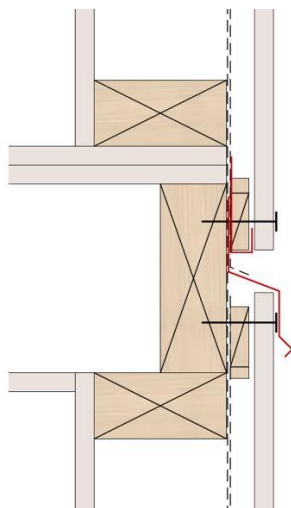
Storey to Storey Expansion Joint for plywood non-continuous cladding
